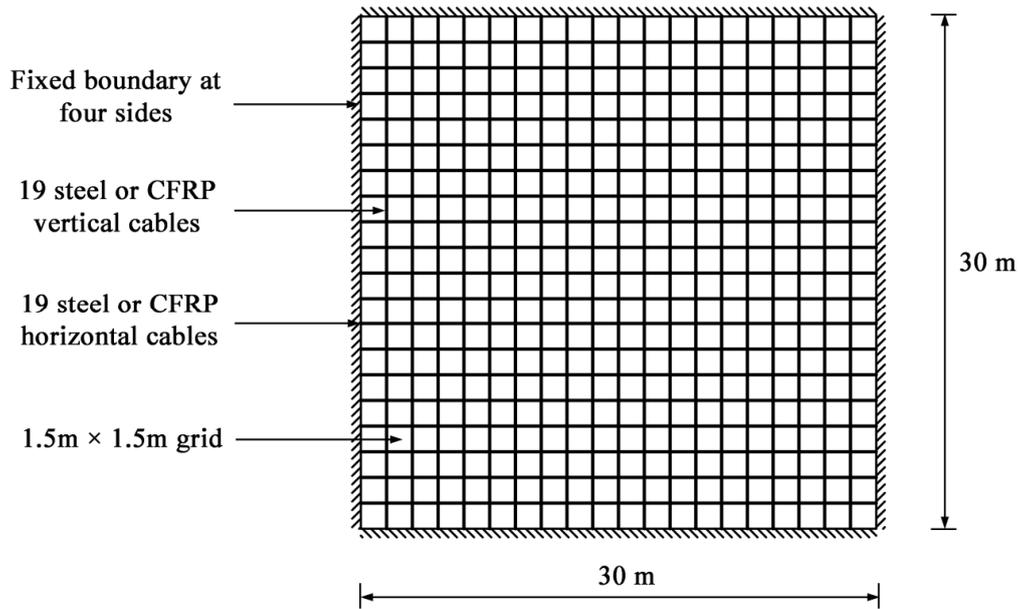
Geometry and boundary conditions of steel or CFRP cable net façade.
